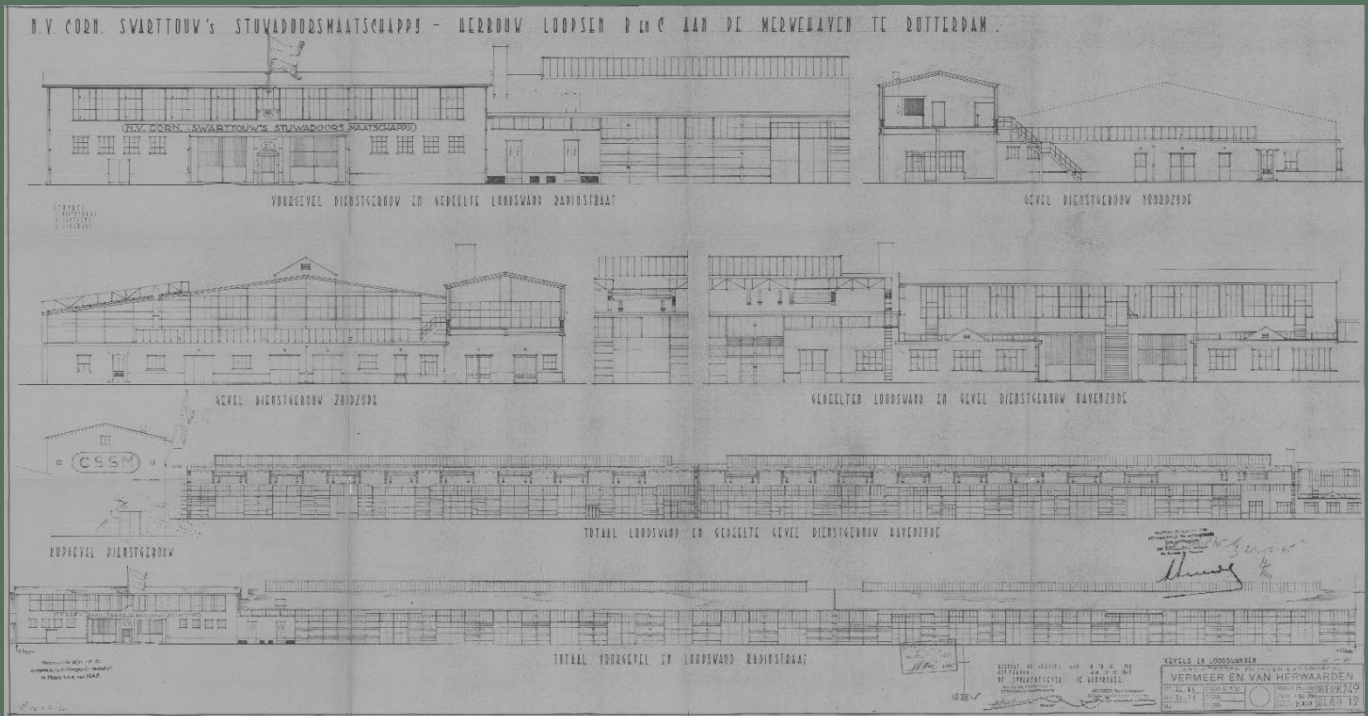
Façade drawings Vermeer and Van Herwaarden architects of warehouses and office building
